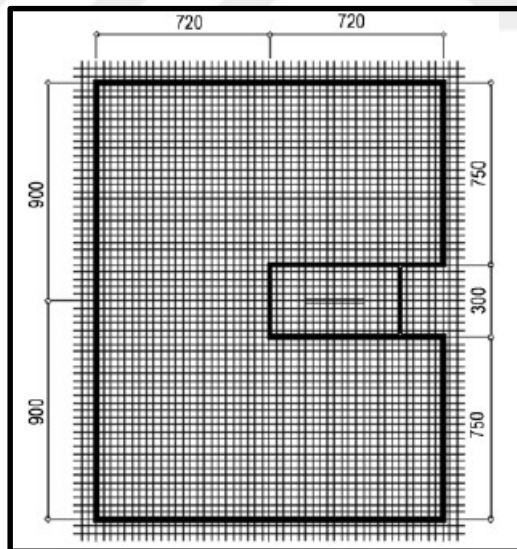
Design of building floor plan geometries and dimensions covering the holistic area of flexible housing units in the form of neutral space [1].
